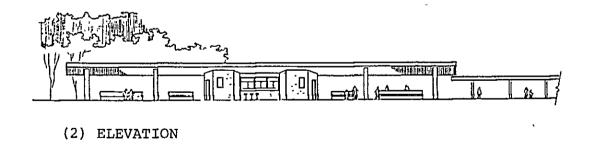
UNIVERSIDAD BUS CENTER PLAN
